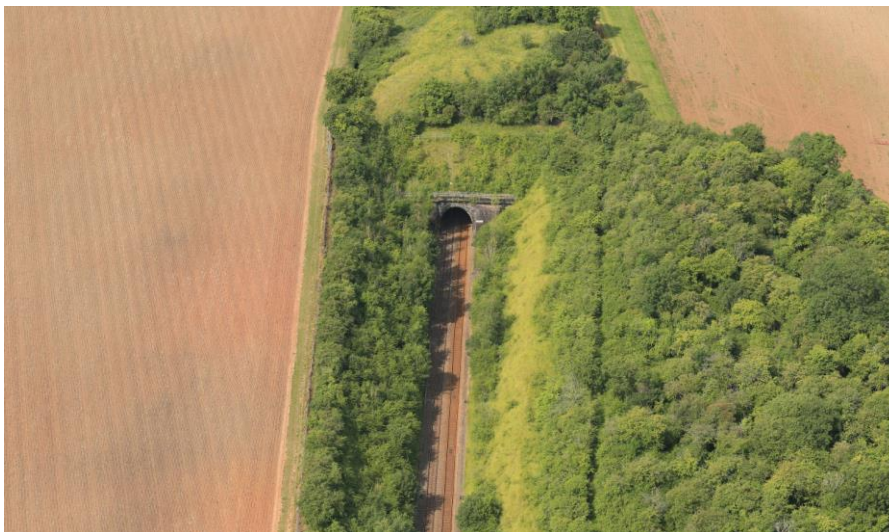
Clareborough Tunnel SSSI (east entrance) a biodiverse ‘hotspot’ surrounded by arable farmland.
